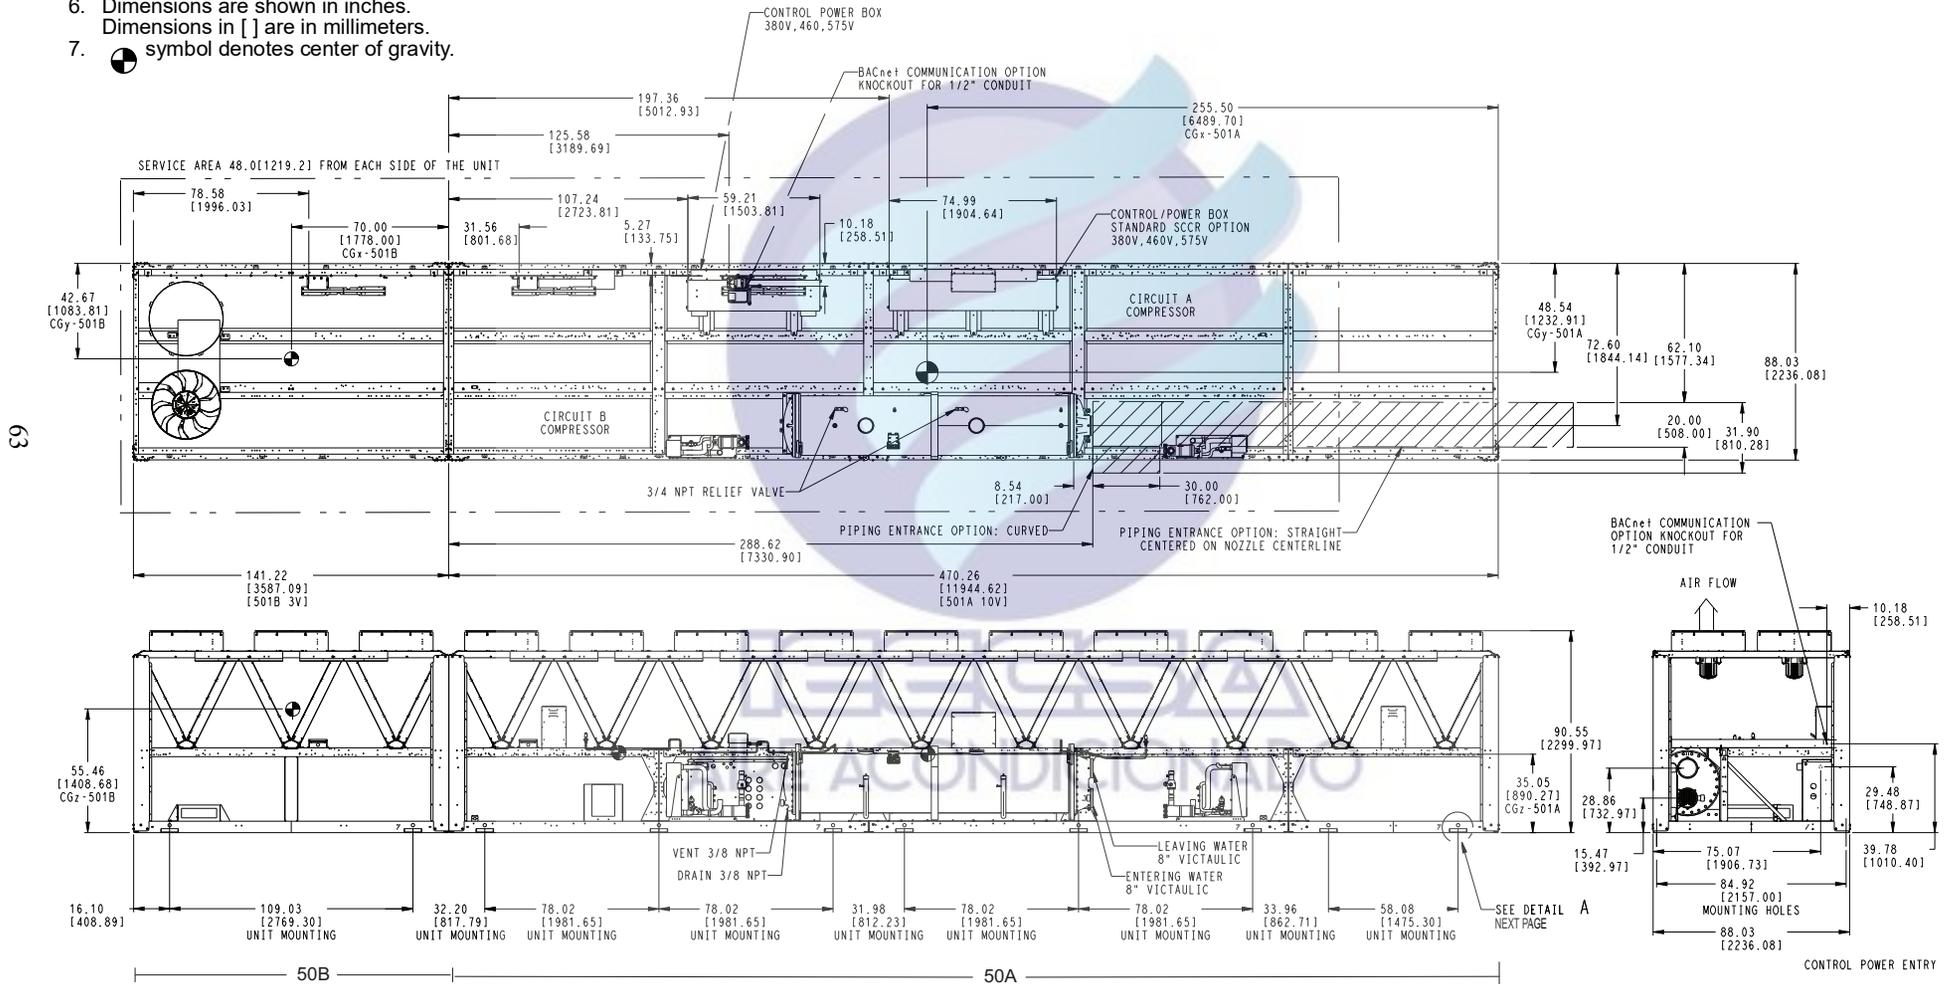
30XA476 Air-Cooled Liquid Chiller Dimensions
